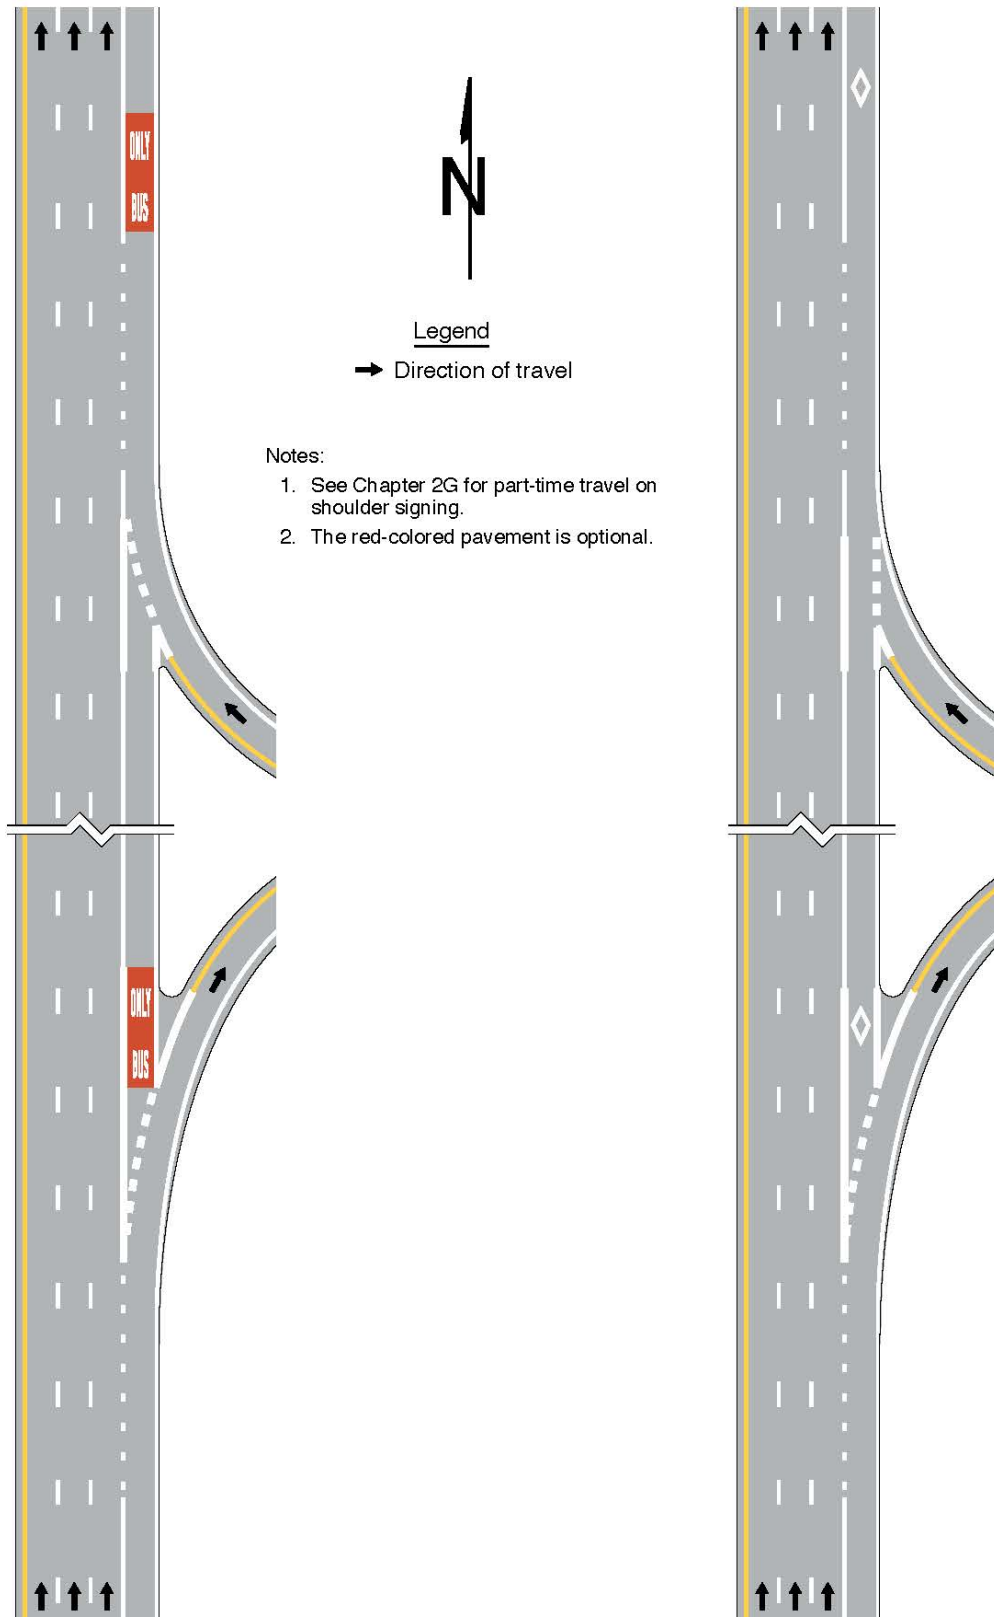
E-5. Markings for Part-Time Travel on Shoulder and Application of Pavement Word Markings (Sheet 2 of 3)
